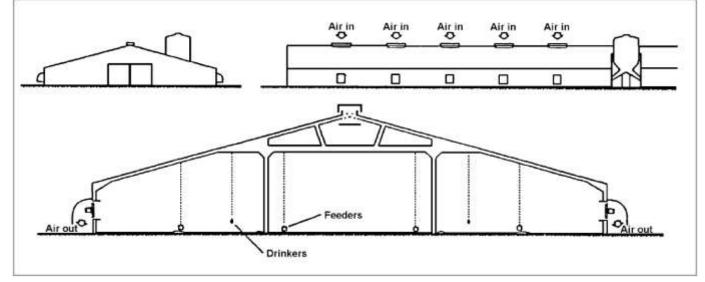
Example of Schematic Cross-section of Broiler House with Reverse Flow Ventilation
